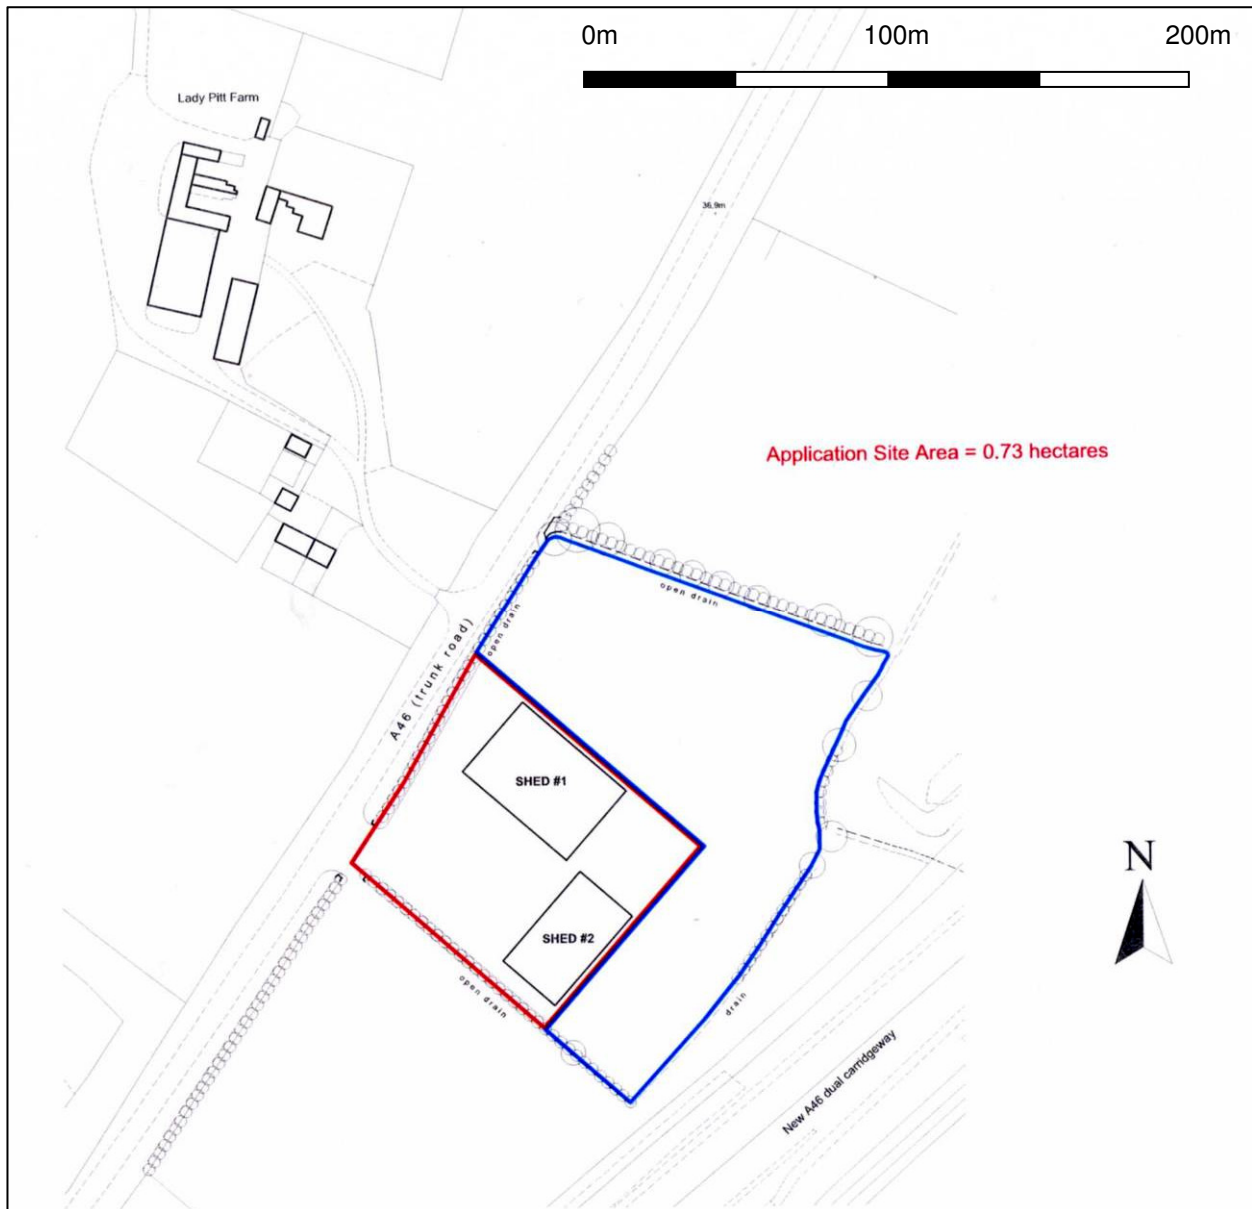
As-proposed plan of the site at scale 1:2500. The proposed development site is outlined in red. Plan supplied by client.
